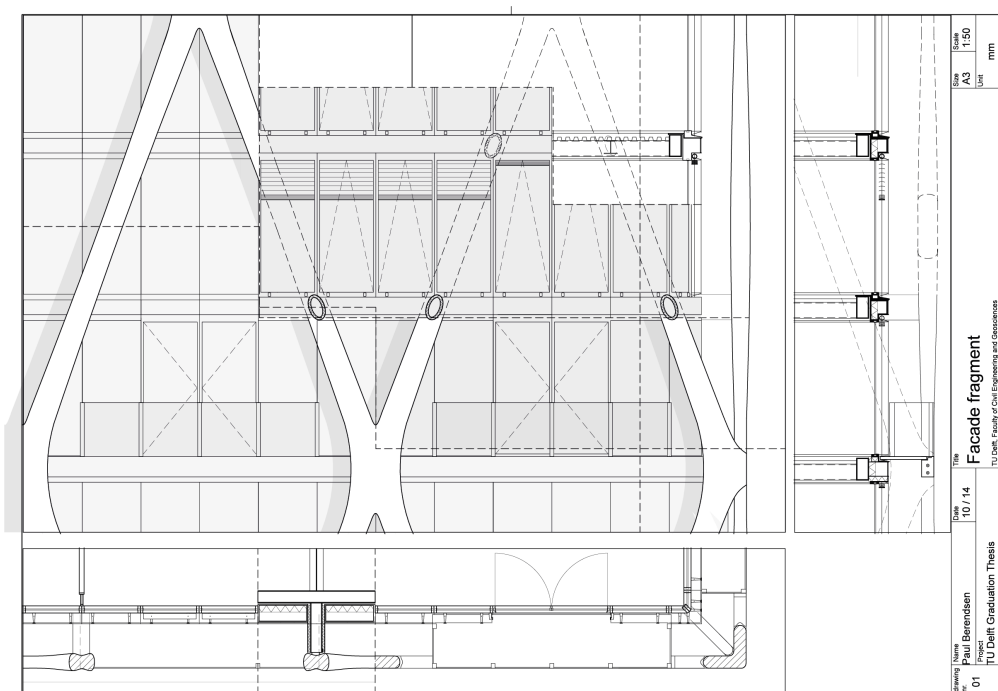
Façade fragment, full size drawing can be found in Appendix I
